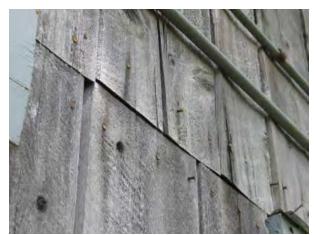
Detail of siding at top of window and door openings on east elevation. Note popped nails.
